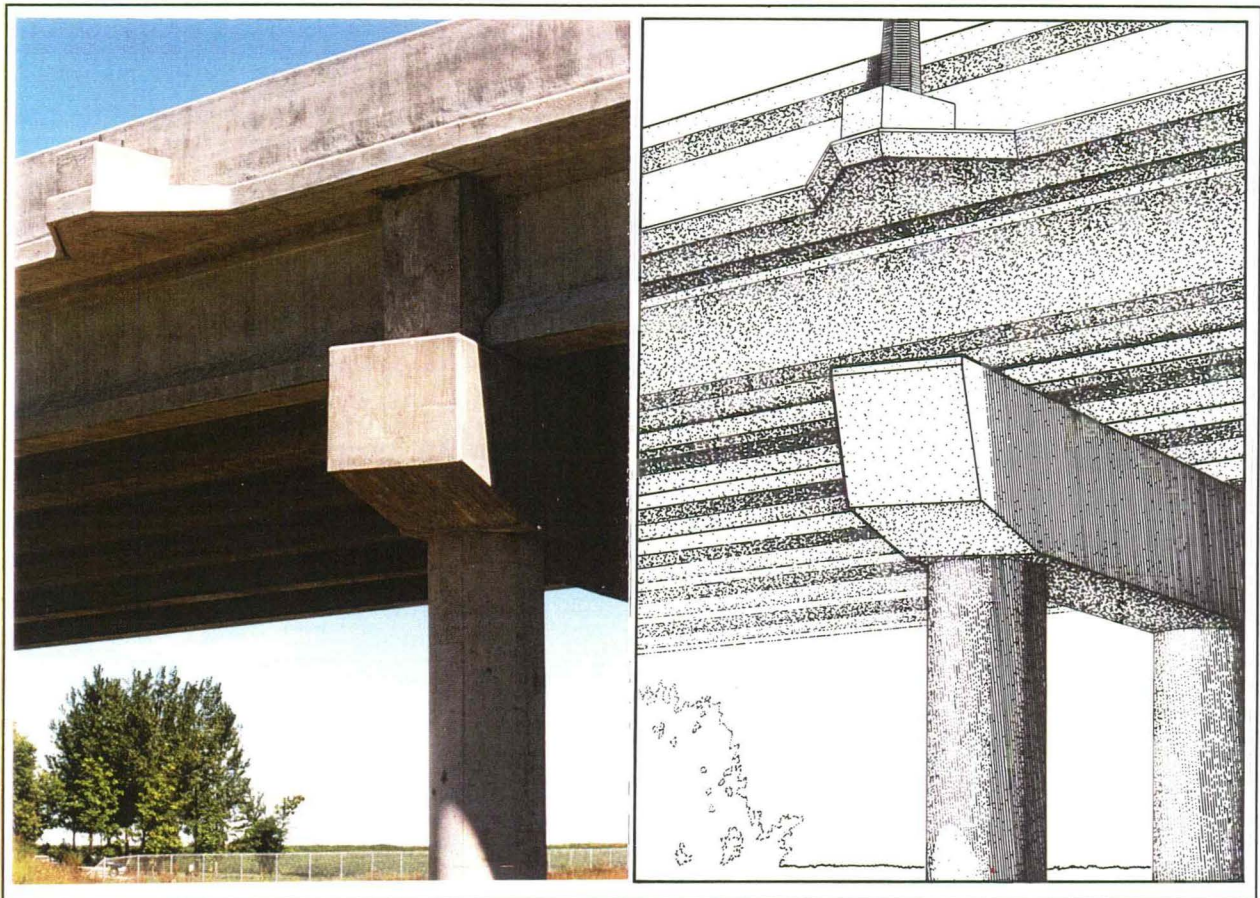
Typical Prestressed Concrete Bridge Pier Diaphragm, Light Pole Base, Pier Cap, Slab Edge, and Barrier Rail as well as Suggested Modifications
